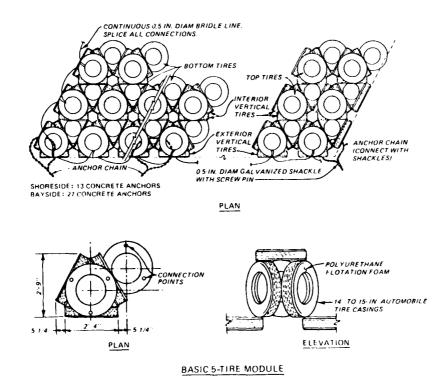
Wave-Maze design breakwater used at Pickering Beach (Office, Chief of Engineers 1981)
